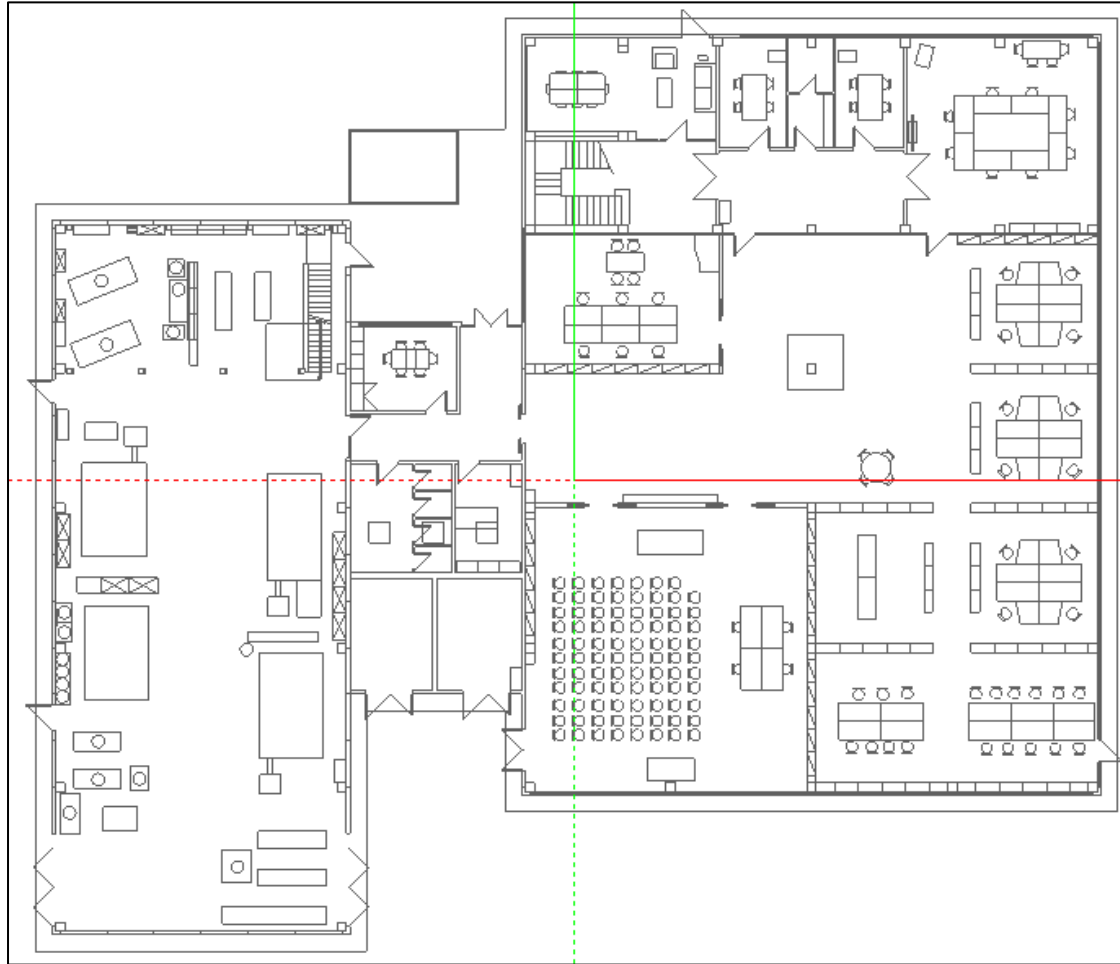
CAD drawing for Ground Floor of SUMMA building.
